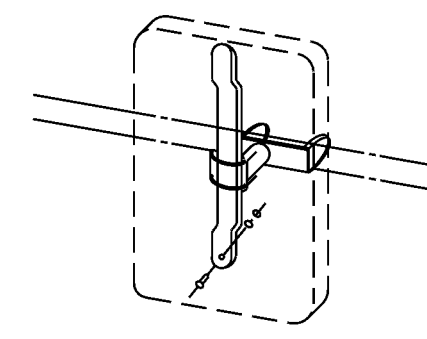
DETAIL - "PELCO" BREAK-A-WAY ASSEMBLY
